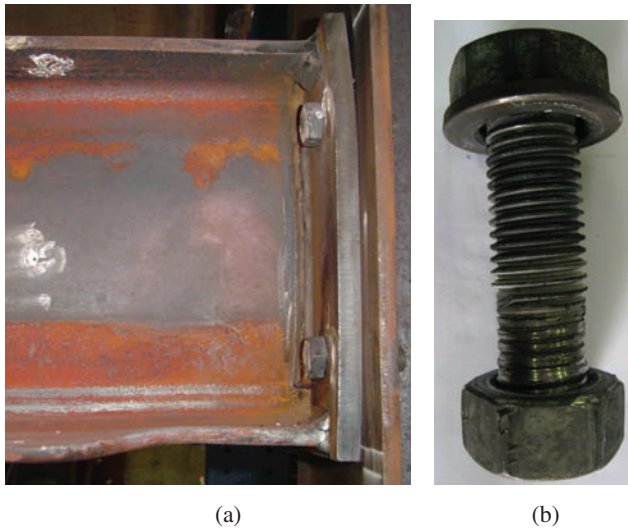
(a) End plate deformation; (b) bolt stripping at FJ02.
